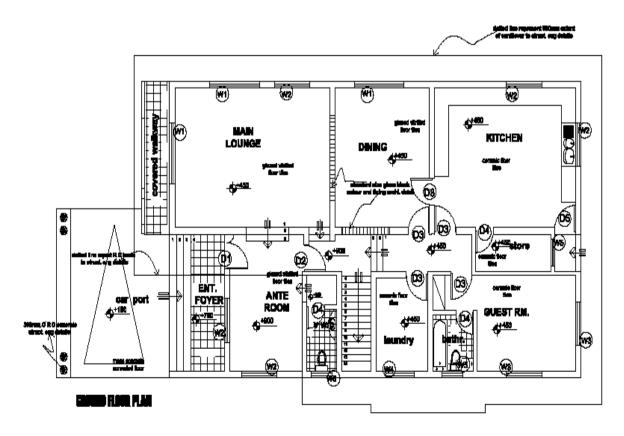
Ground Floor Plan of a Typical Detached Duplex Building
